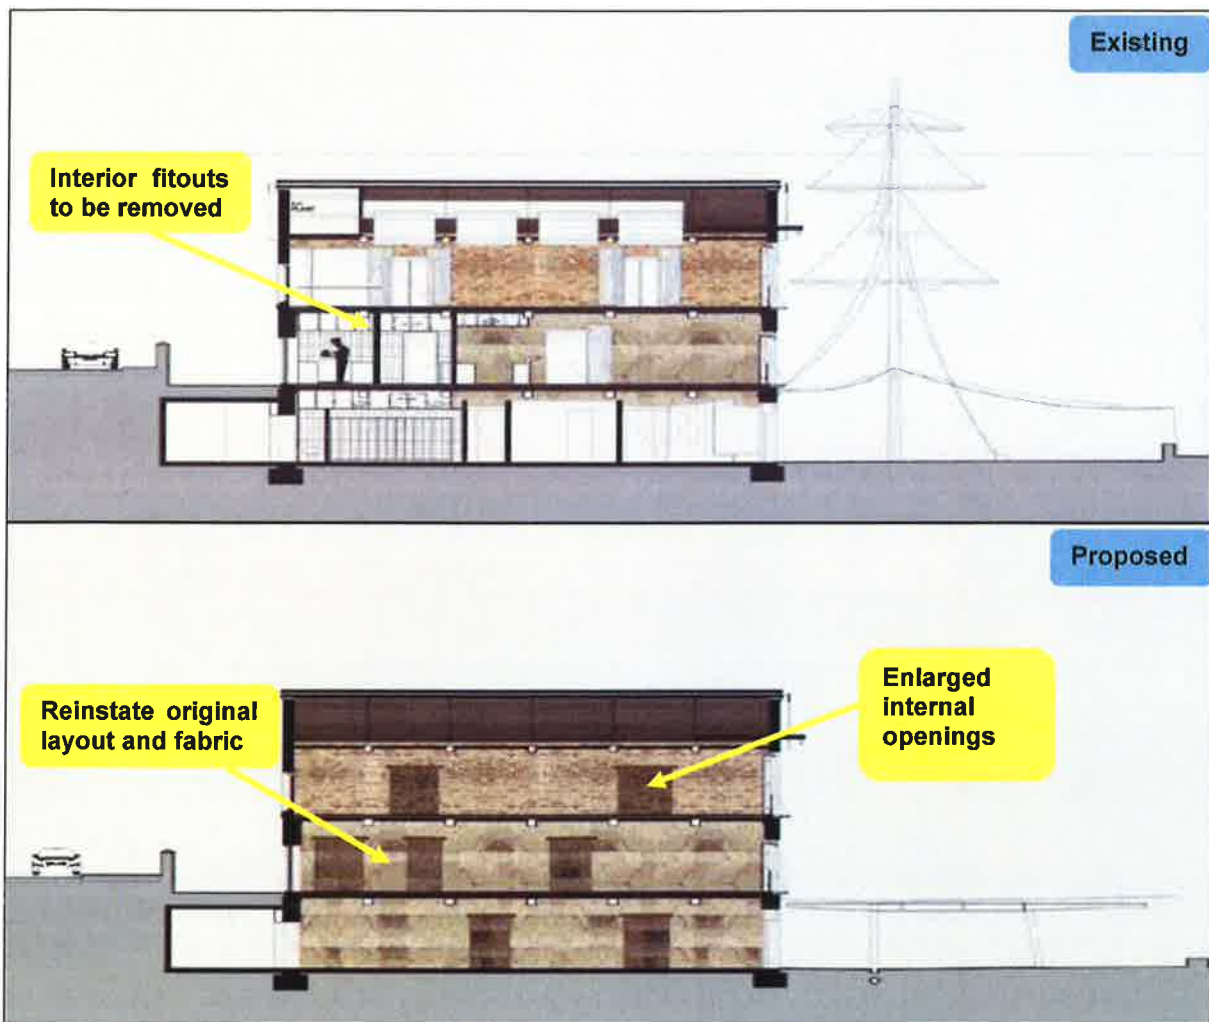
The proposed removal of the existing restaurant fit-outs to reveal original fabric. (Source: Applicant's EIS).
